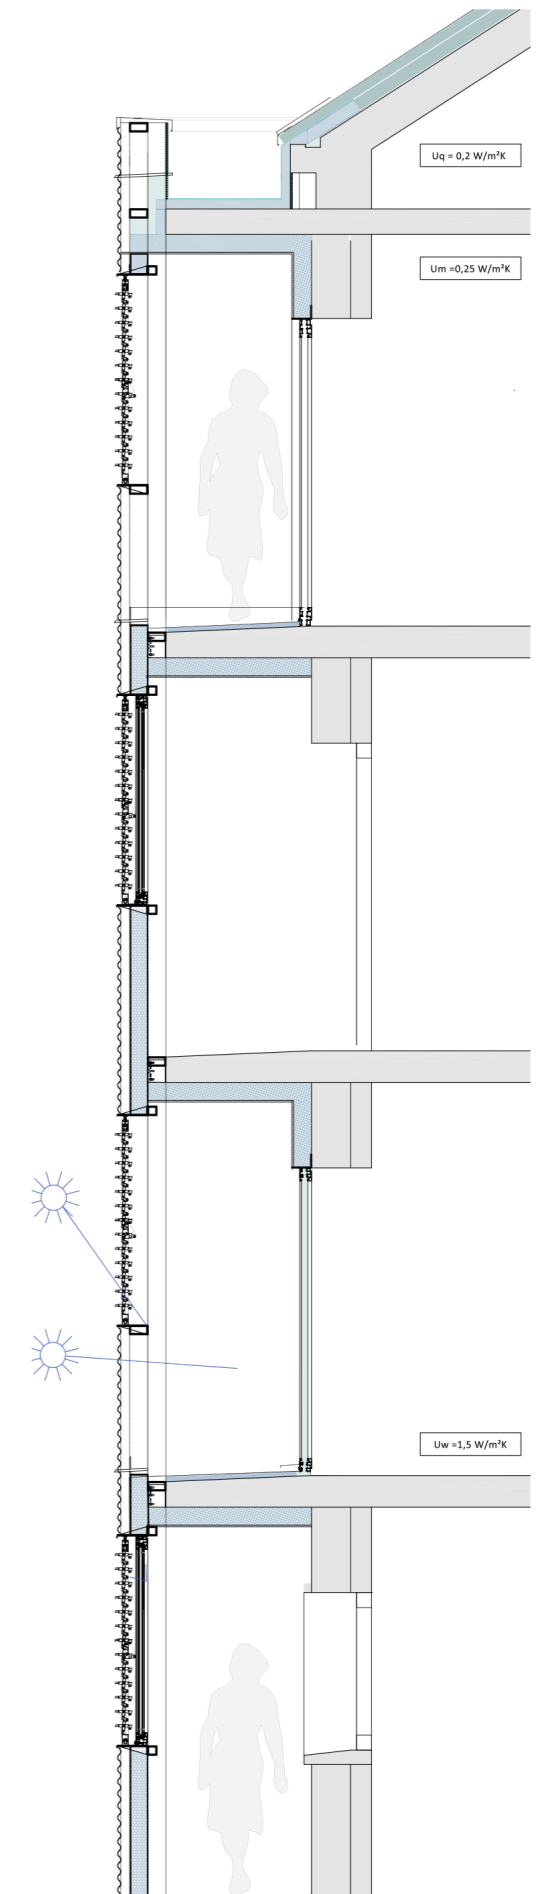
Detail section drawn by the architects ⁽²³⁾
